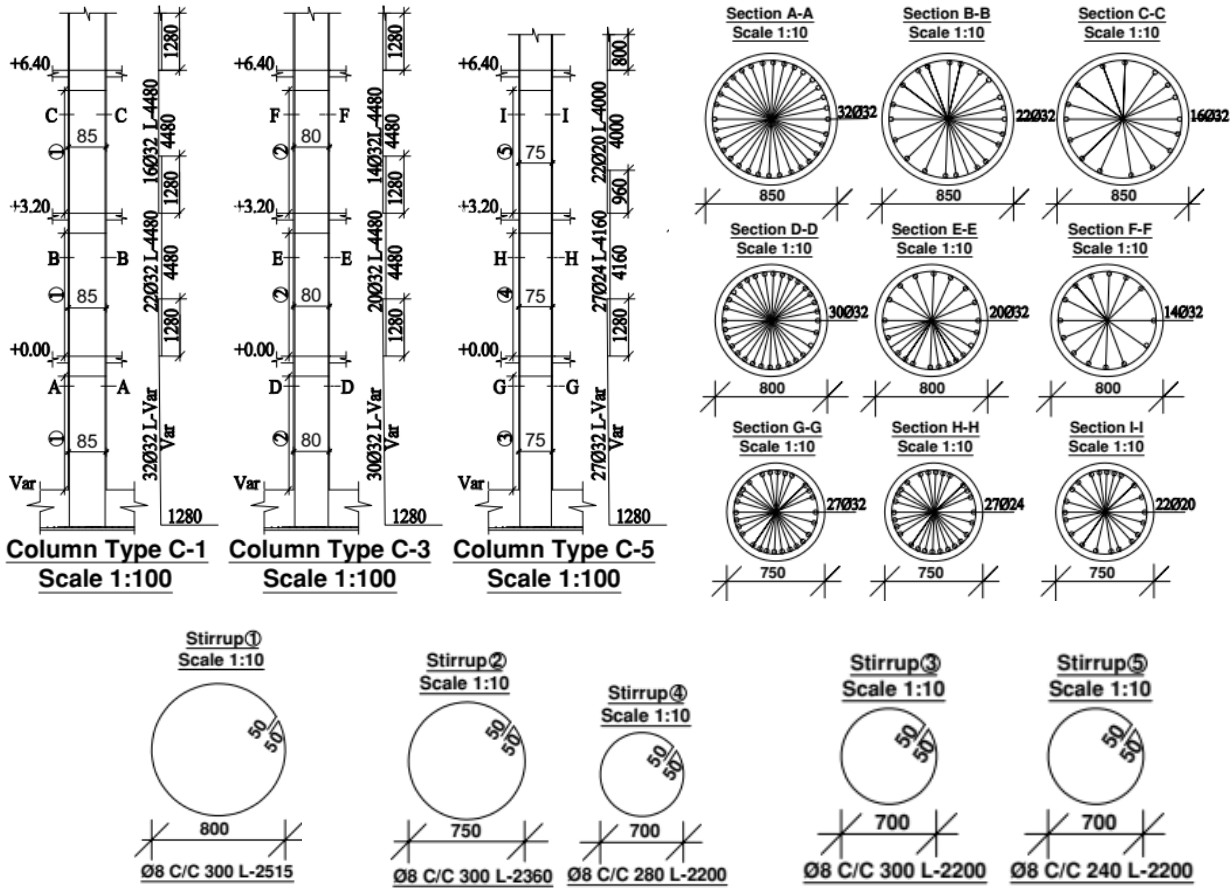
Sample column detailing for G+12 building with C-25 concrete
